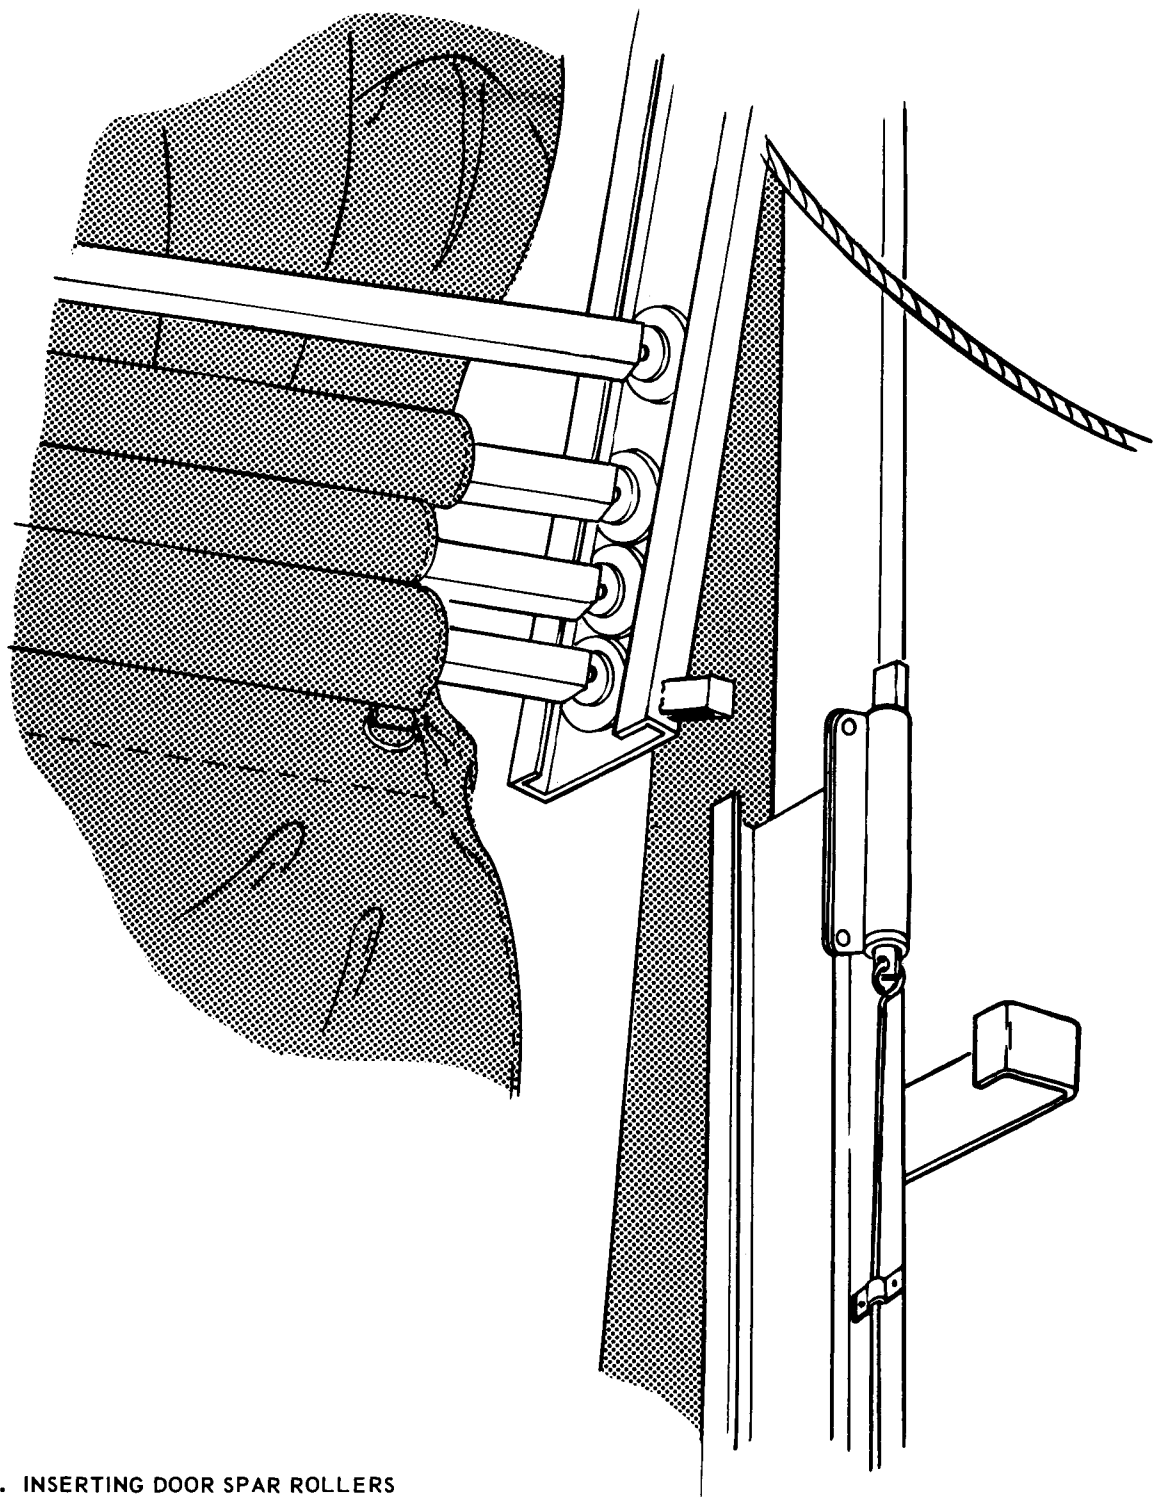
Locking and partially installing door spars (Sheet 2 of 2),
